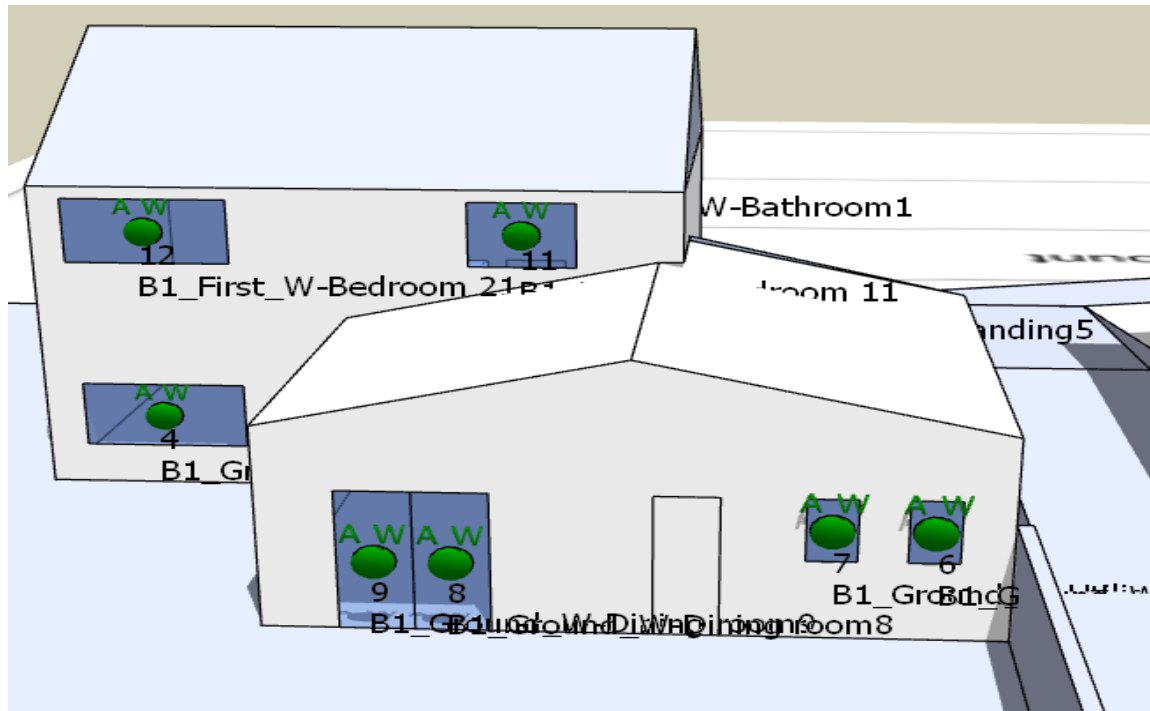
Surrounding Buildings B1-windows to be assessed – Rear elevation of 8 St Michaels Mount
